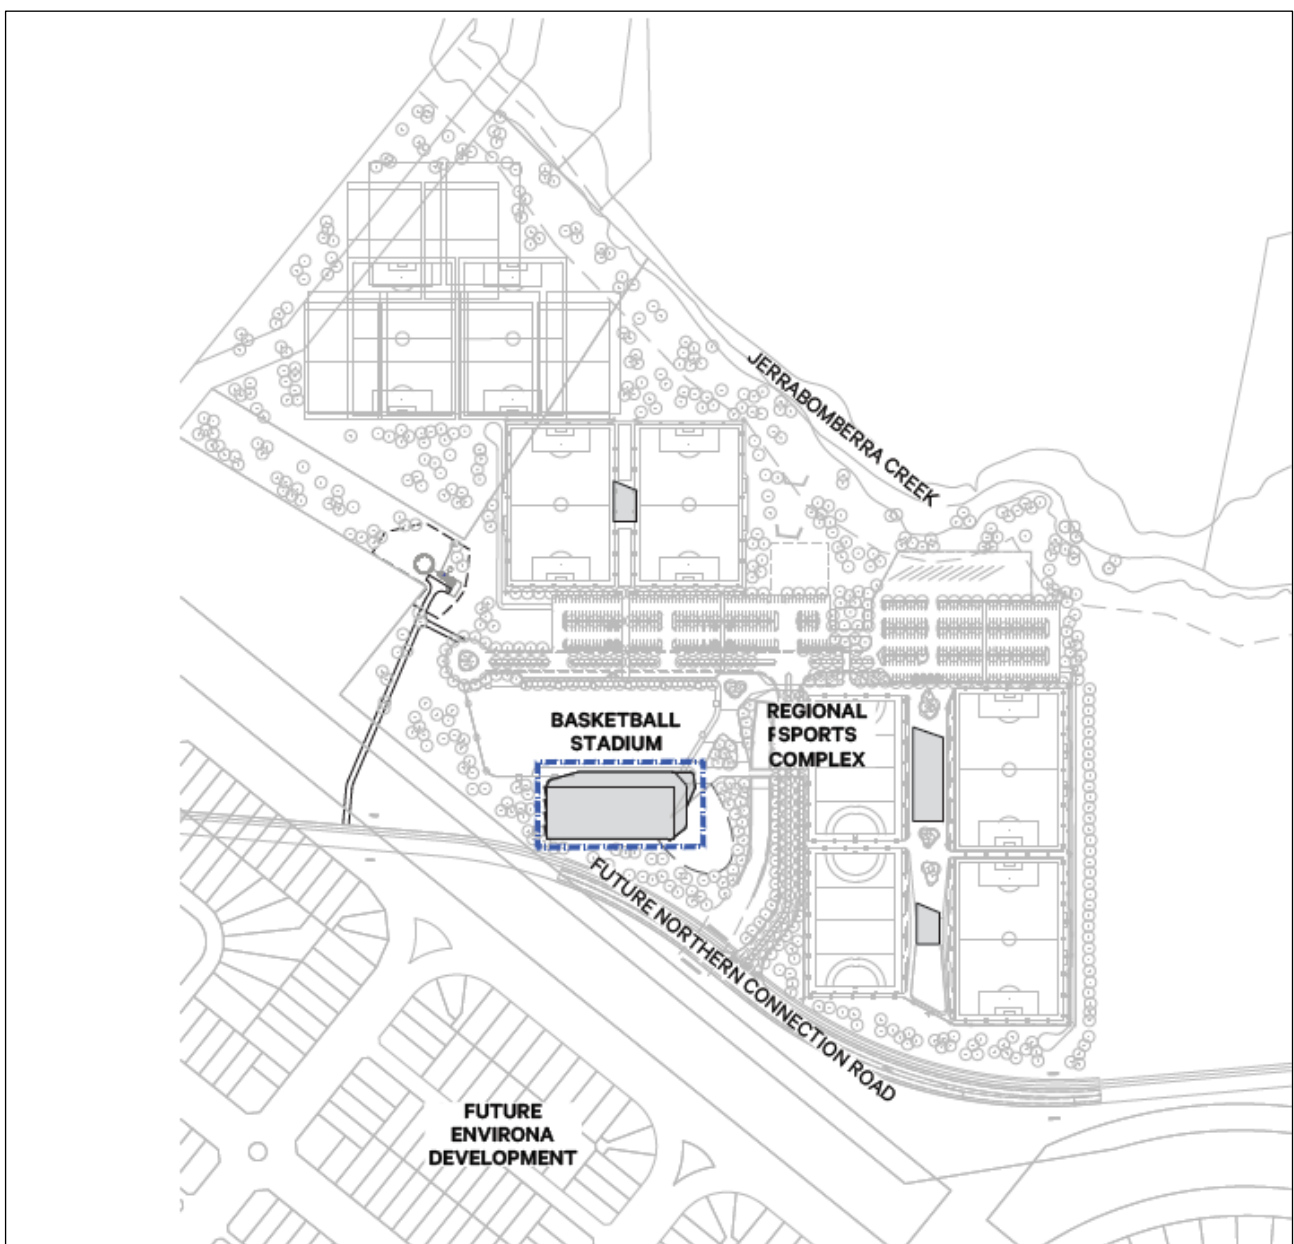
Site Plan, Oxygen architectural plans DA.2020.1351 submission
